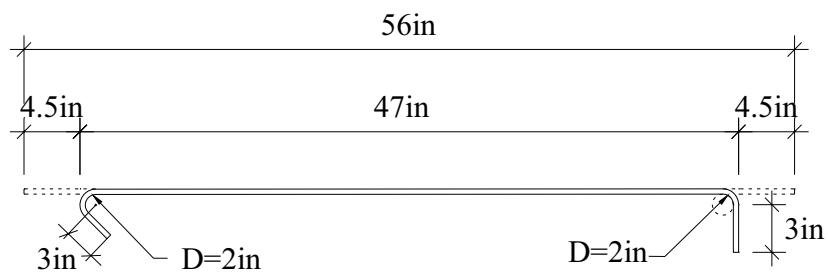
Section B-B; Cross Tie (C) #4 - Side 50 in; Specimens H1 & H2
